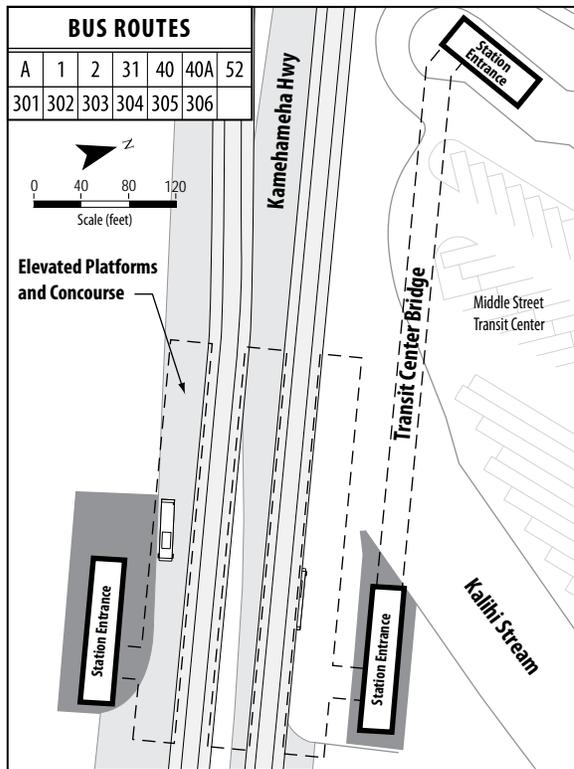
Middle Street Transit Center Station (All Build Alternatives)
